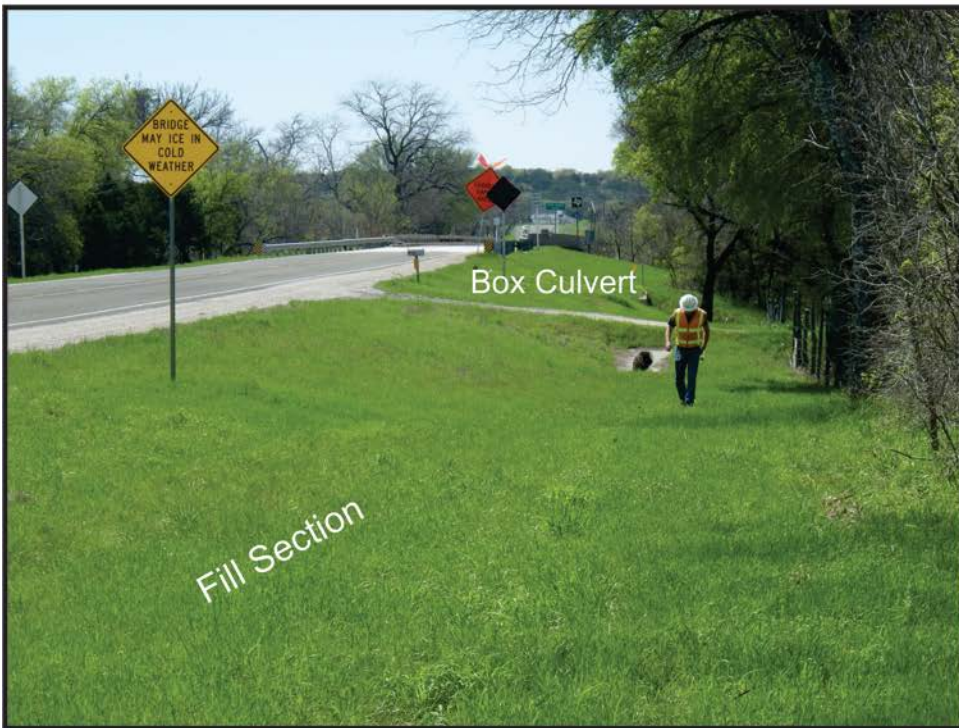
Looking south at NW quadrant with fill section and box culvert at Cowhouse Creek.
